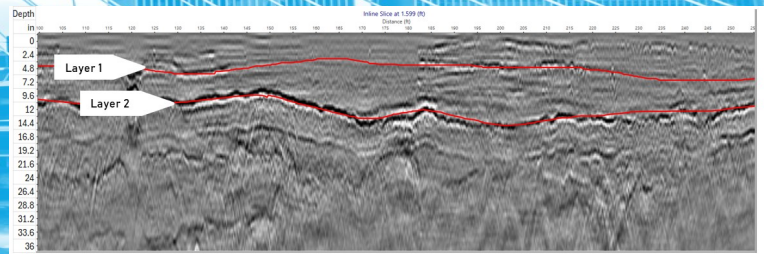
Typical pavement profile within section 1 (108+50 to 111+50)
